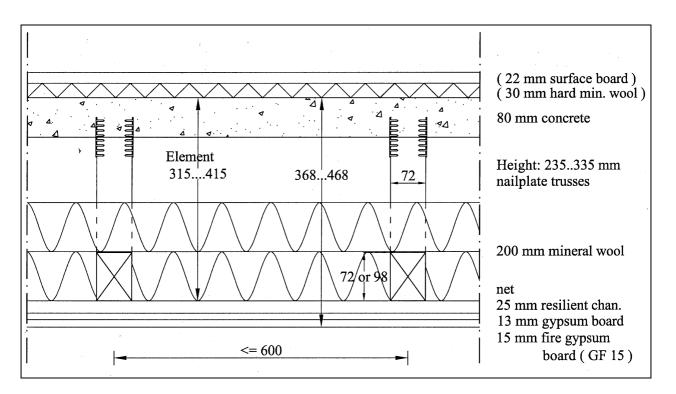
Cross section of the element wood-concrete composite floor (multi-storey house case).
